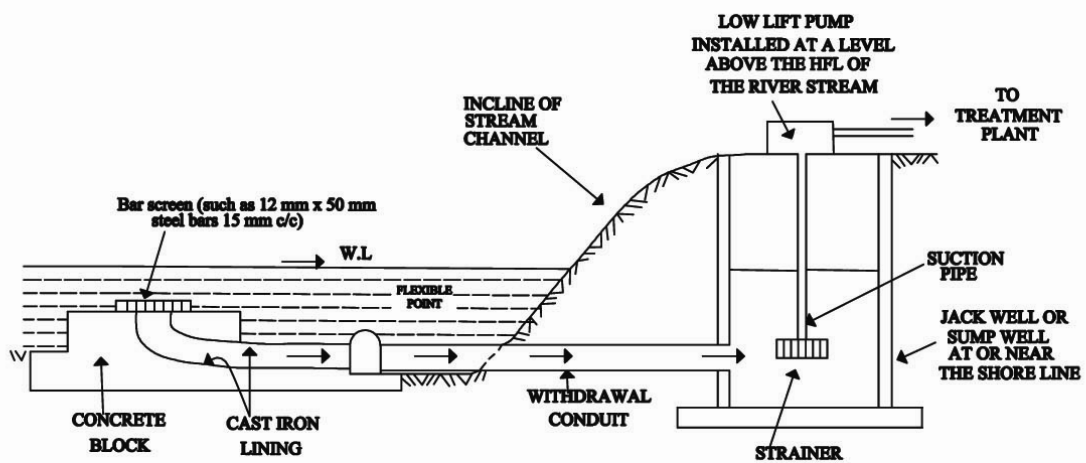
SIMPLE CONCRETE BLOCK-SUBMERGED INTAKE
